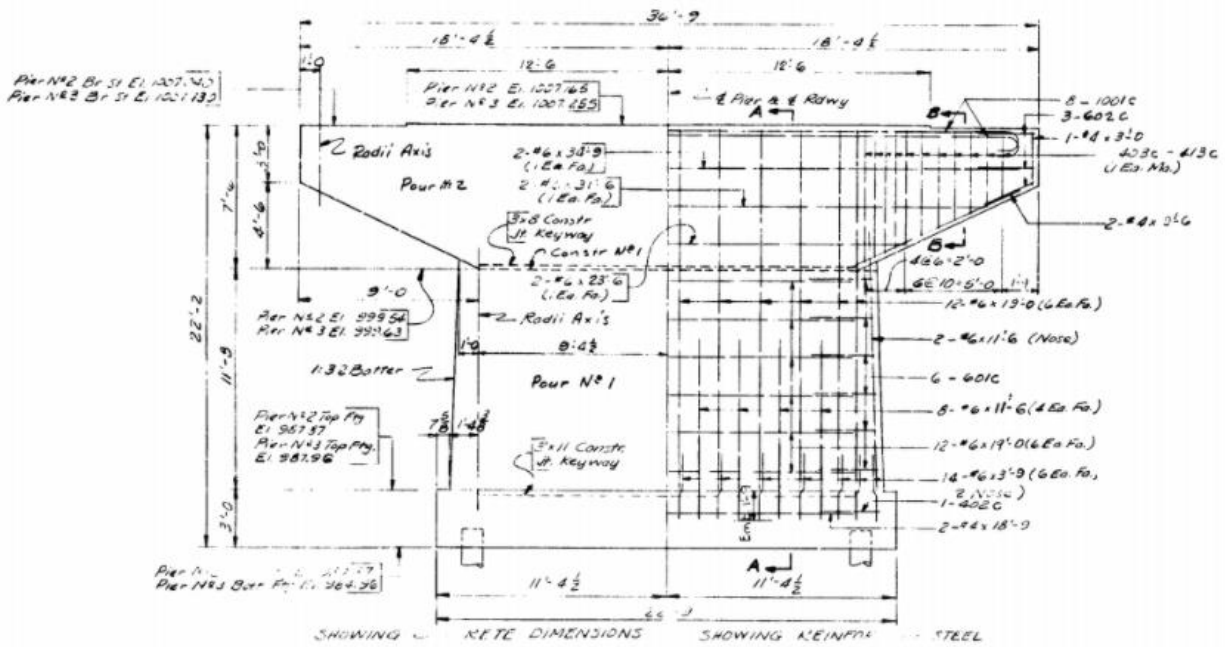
Transverse Elevation of Interior Pier (NBI 13000) (1957)
